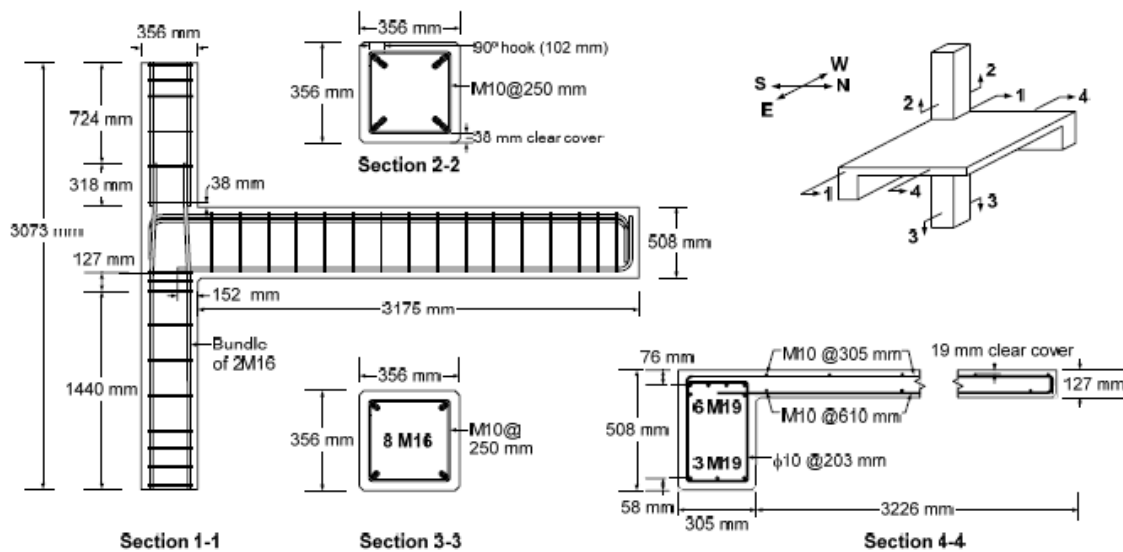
Specimen geometry and details and test setup, Engindeniz [41]
